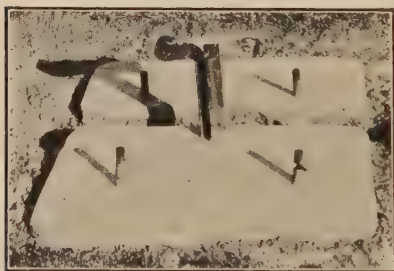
Concrete base complete, showing anchor and bolts in place.
